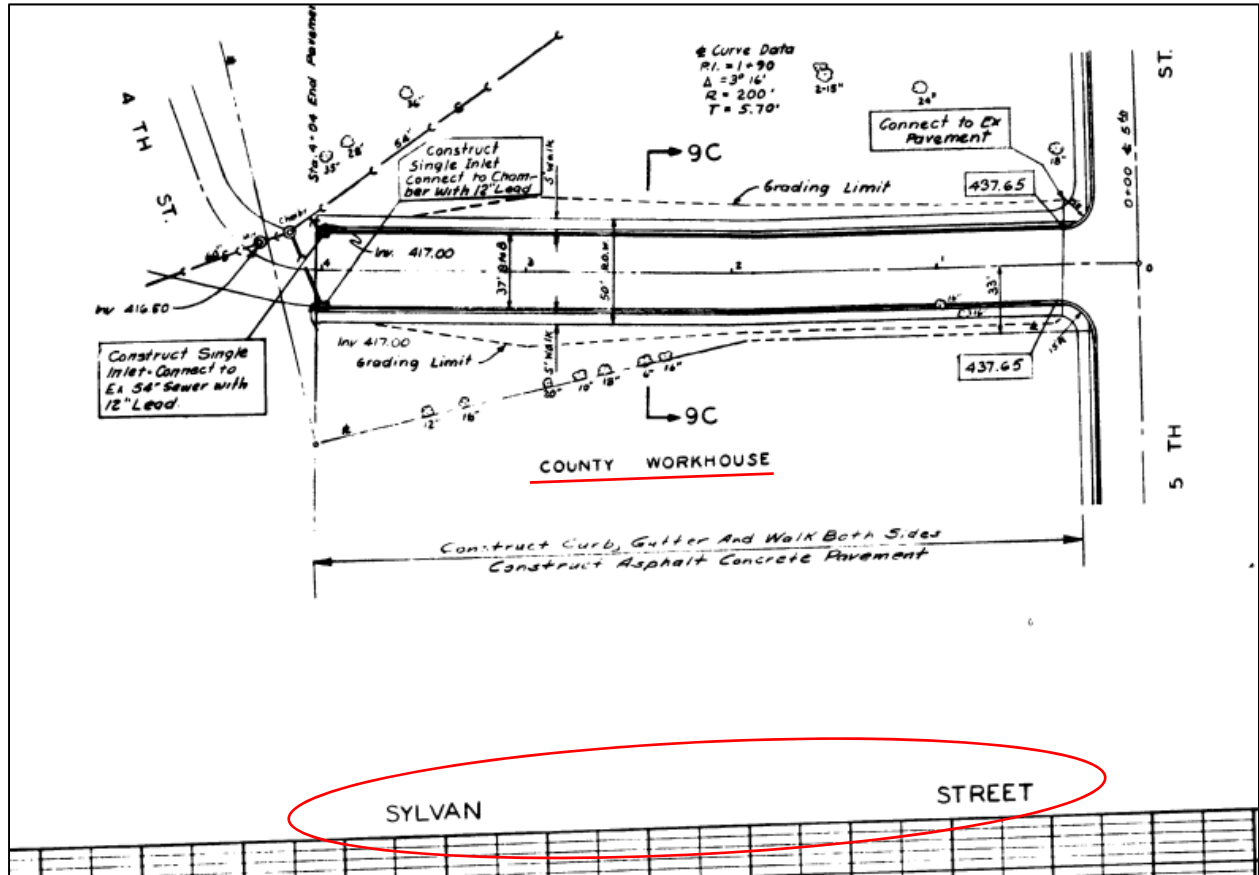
MDHA East Nashville, Contract T, 1962 Urban Renewal Plans, As Built Plans – Sylvan Street. Source: Metro Nashville Public Works.
